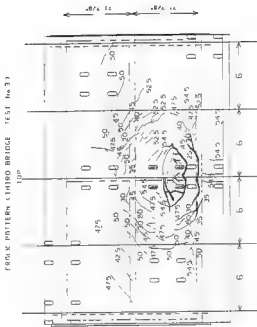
Top Cracking Pattern (Third Bridge - Test No 3)
